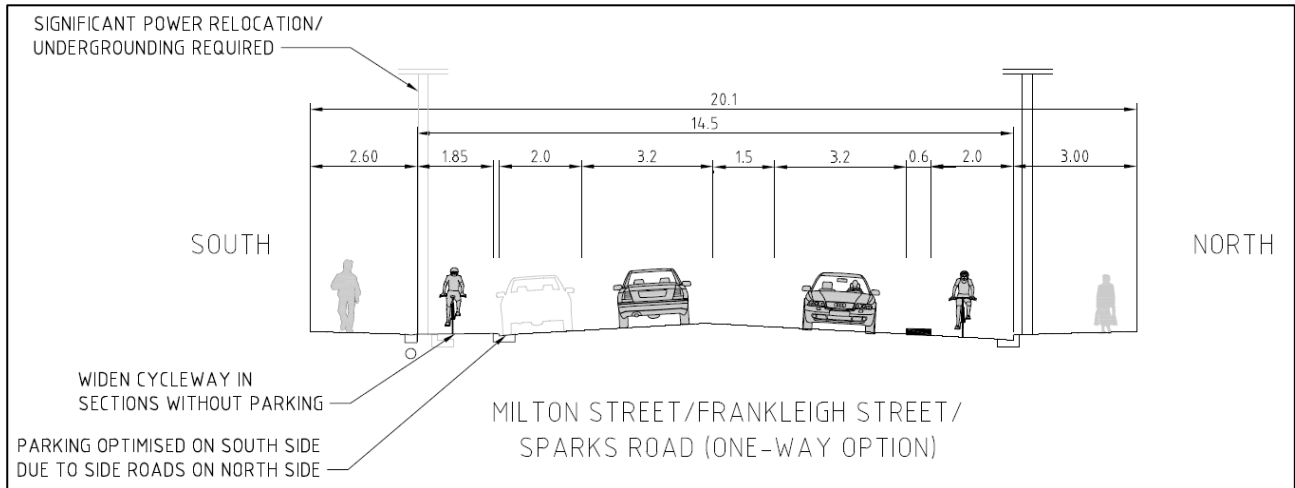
Cross-section option to retain parking on one side of Milton Street/Frankleigh Street/Sparks Road
